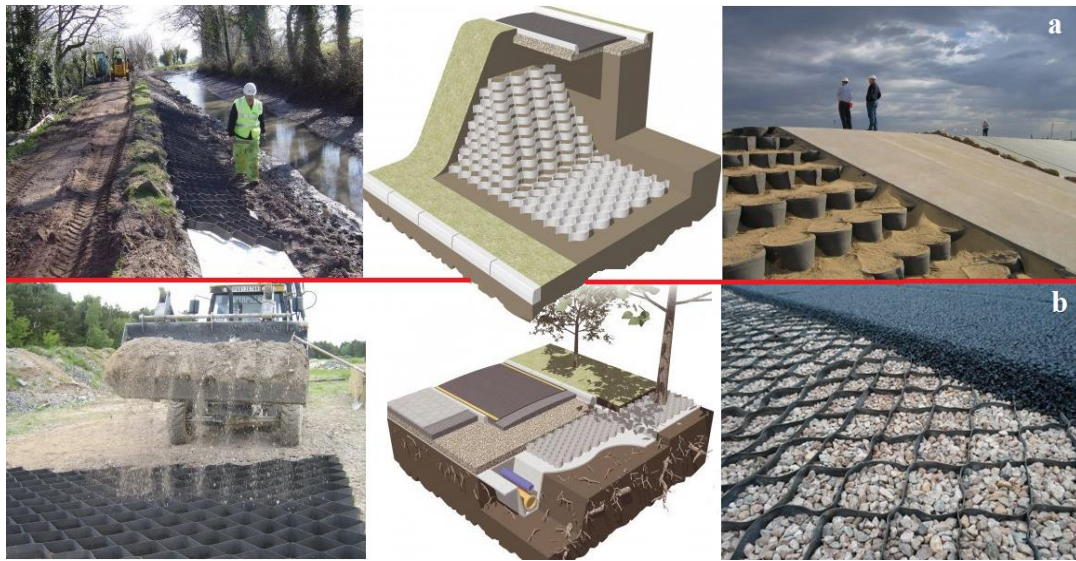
Applications of geocells (a: channel lining, retaining wall, erosion and slope protection, b: road and foundation basement, soft ground reinforcing, Terram, www.terram.com, last visited on September, 2017)
